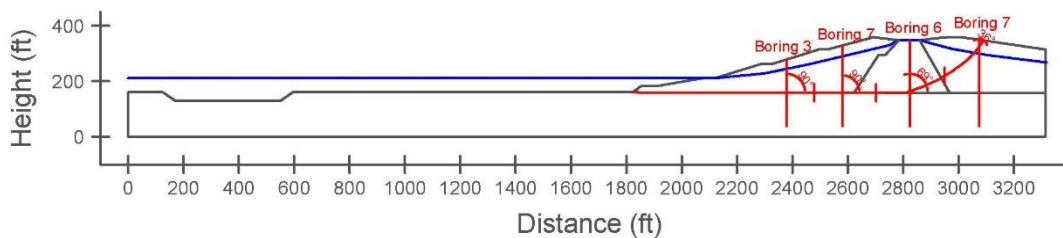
Sub-sectioning of the cross-section and failure plane for Fort Peck Dam
